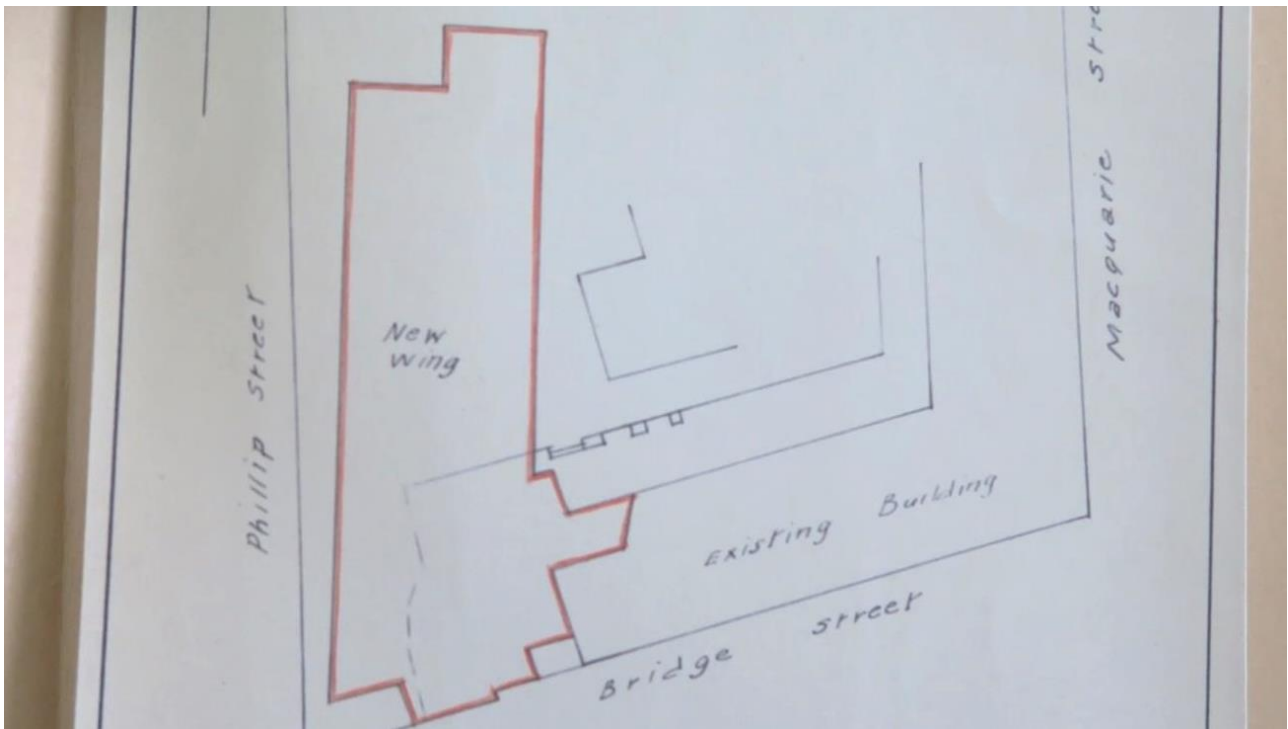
Extract of plan showing proposed new Treasury Building Wing along Phillip Street (1947)
